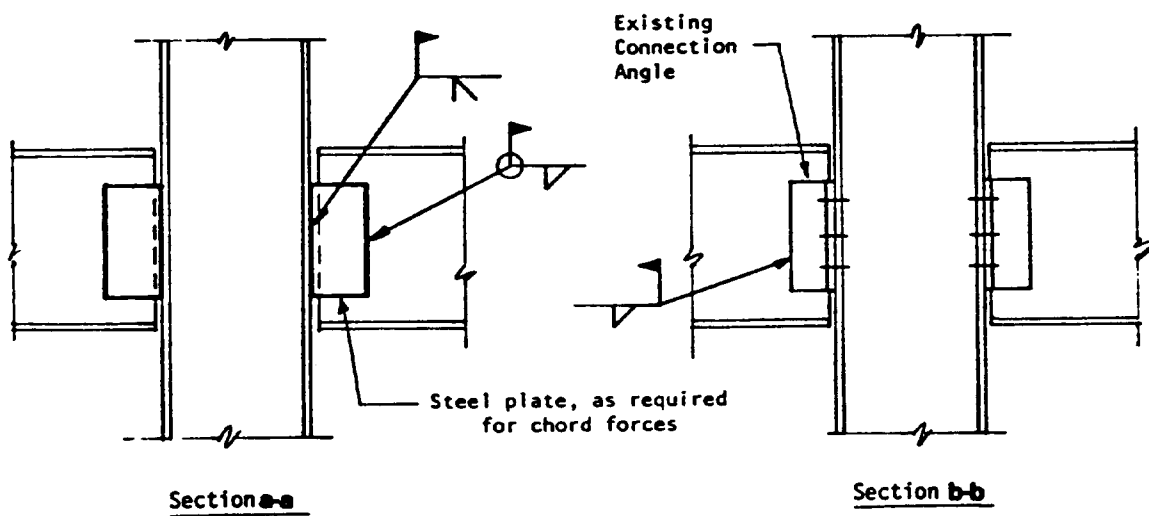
Modification of existing steel framing for diaphragm chord forces
